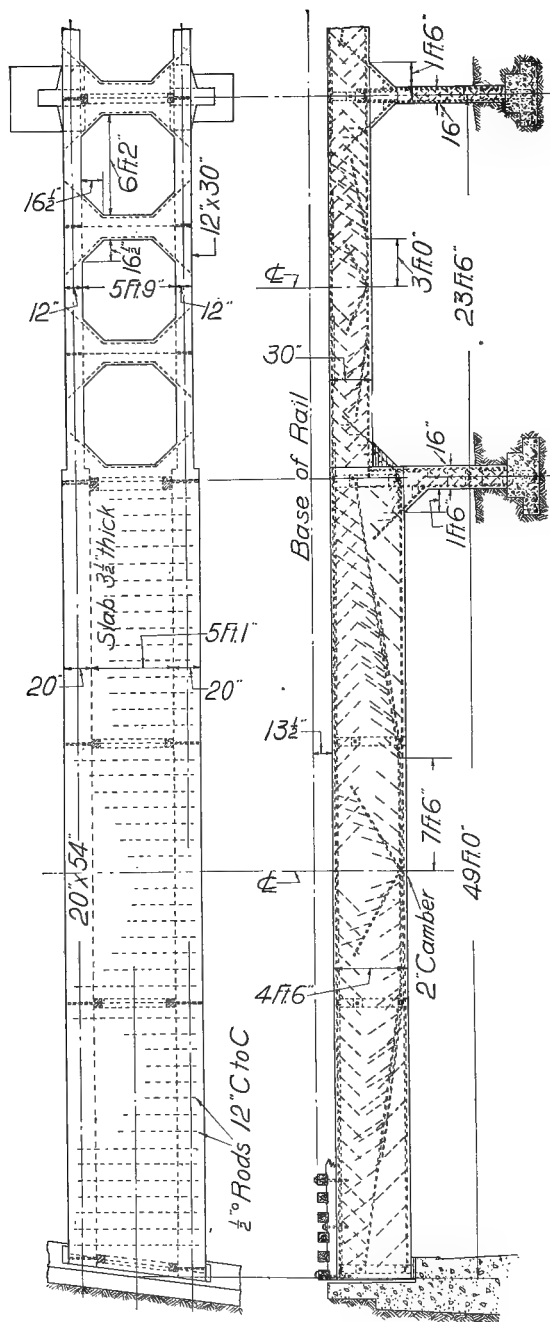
PLAN AND ELEVATION OF RICHMOND VIADUCT.
